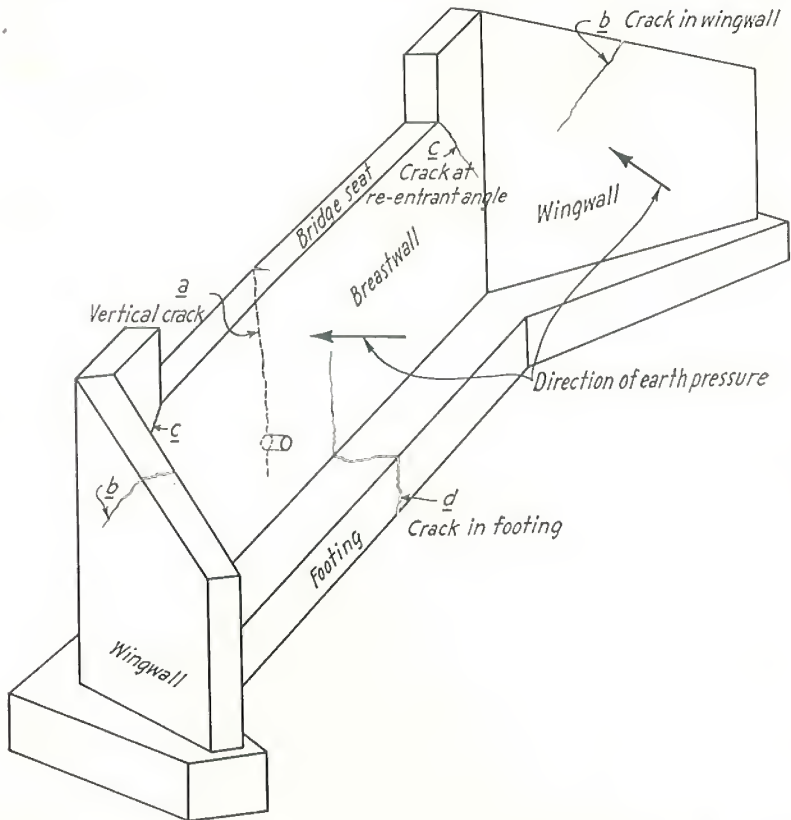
Typical cracks that may develop in the common abutment type when the conventional analytical methods take little or no account of the actual behavior of the abutment.
